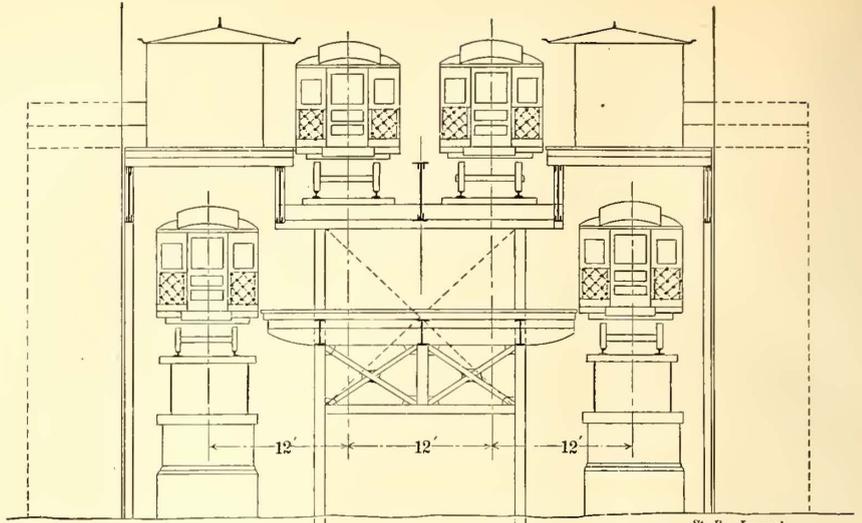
CROSS SECTION OF PROPOSED ELEVATED STRUCTURE AT 138TH STREET, BRONX BOROUGH
